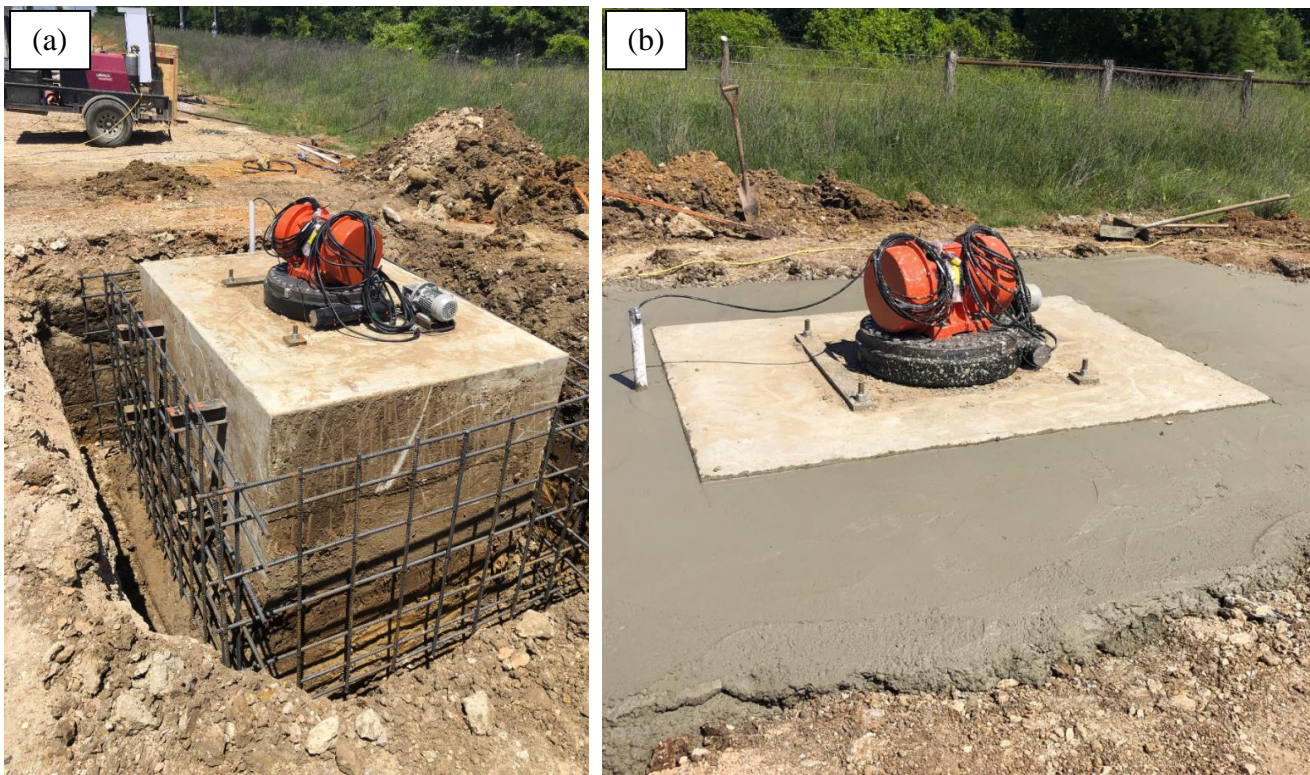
Retrofit to SOV foundation: (a) Surrounding re-excavation of existing foundation; (b) Completed retrofit of existing foundation.
